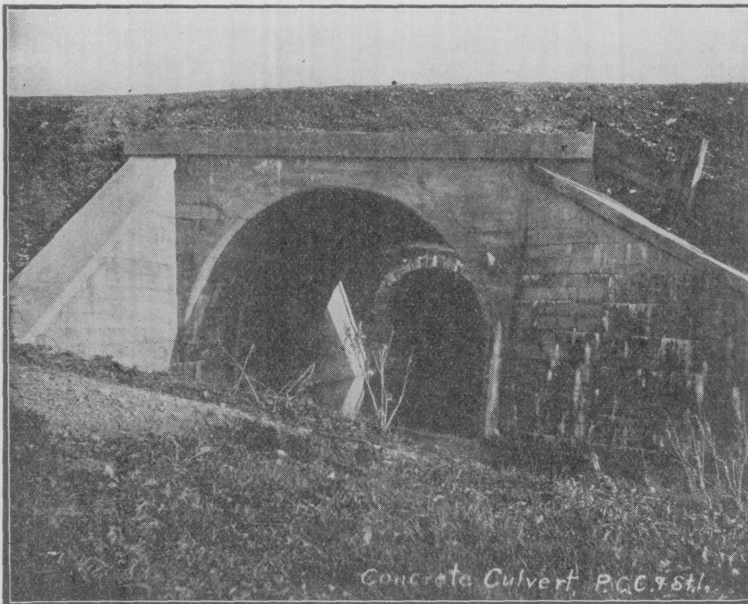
A Concrete Culvert Replacing That Shown in Fig. 16.
